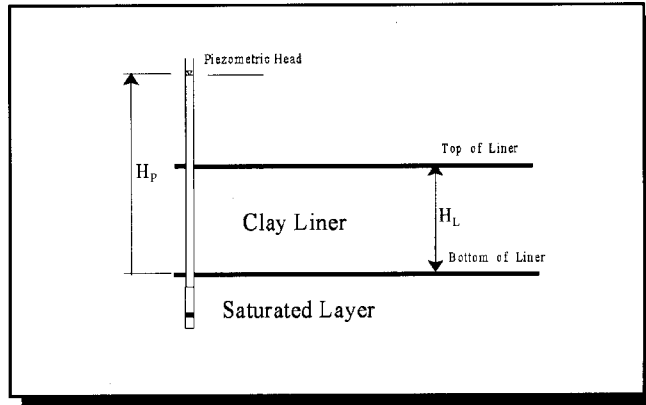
An example of piezometric head from ground water exceeding the top of an engineered component or soil layer creating a potential for hydrostatic uplift .
